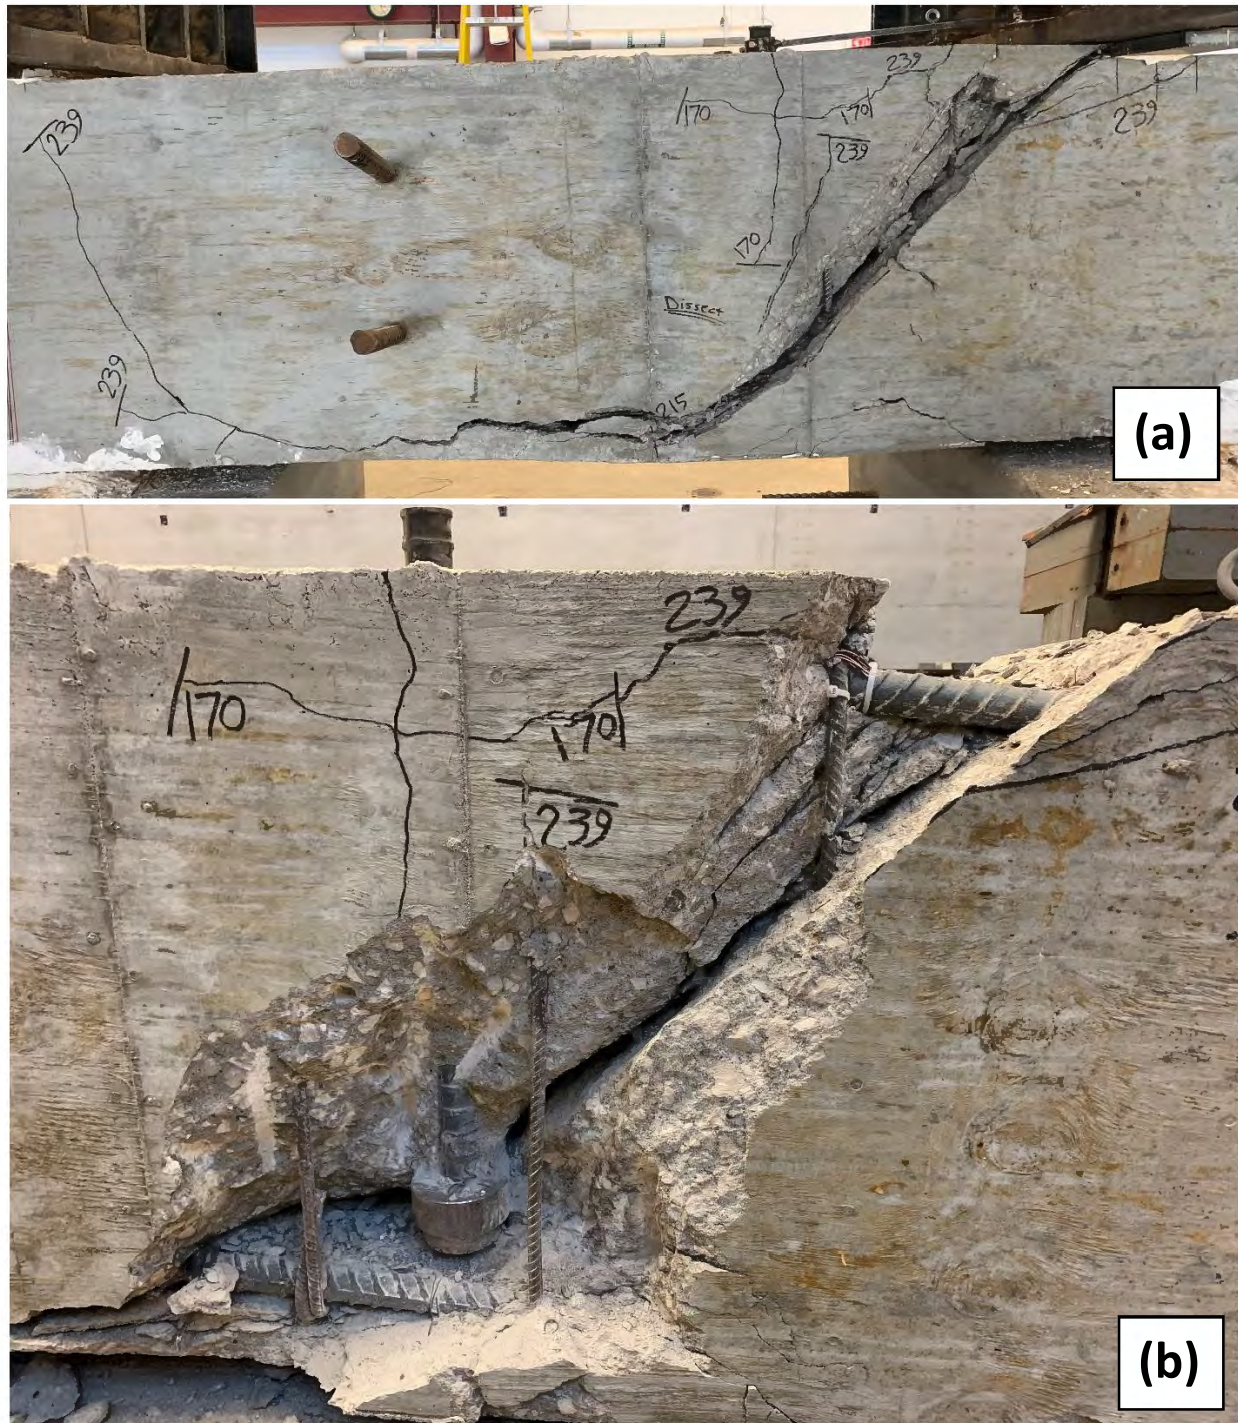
Shear-like failure observed in specimen 14-16 ($A_{tt}/A_{hs} = 0.178$) tested under loading condition A: (a) after failure and (b) after dissection
